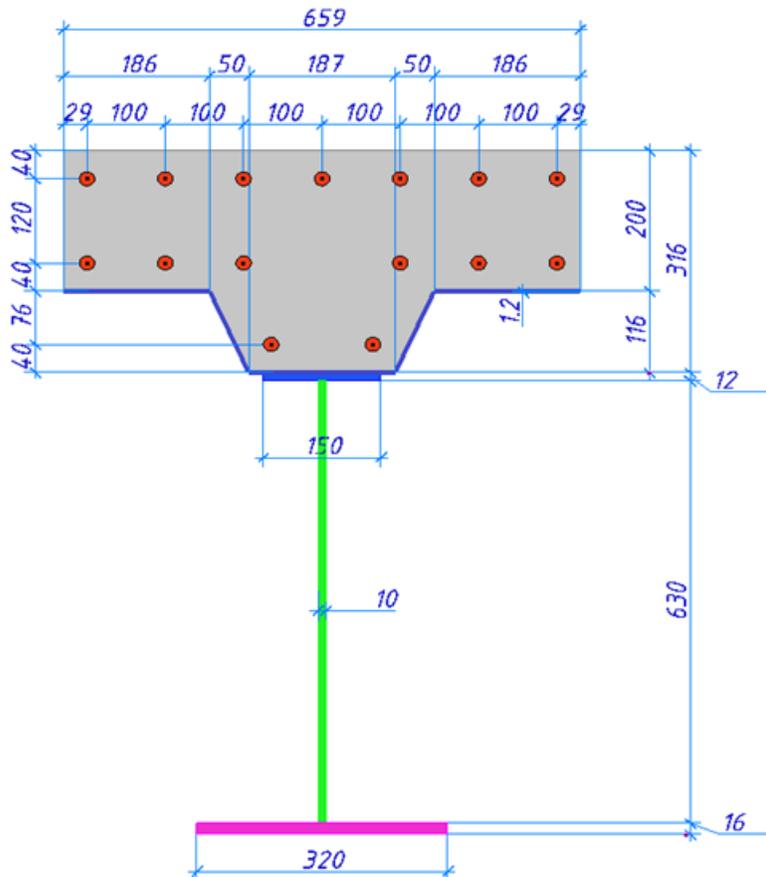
Cross-section of the composite (RC & steel) floor slab
